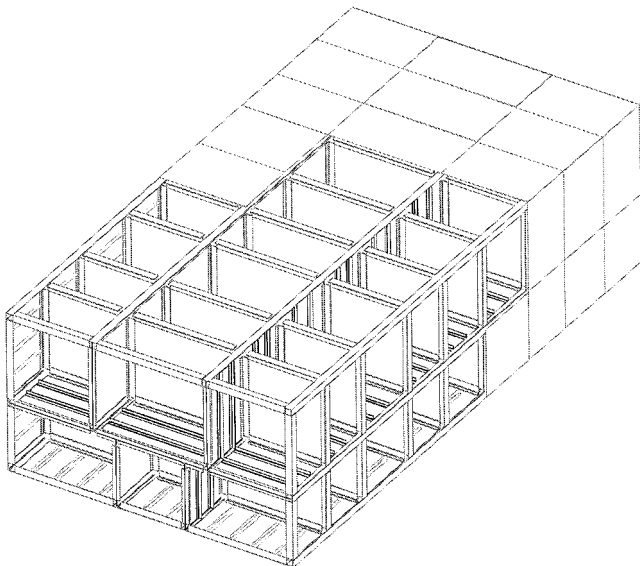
CAD view of the experimental structure. The structure is entirely closed for experiments, but some outer plates have been removed on the sketch to make its main frame visible.
